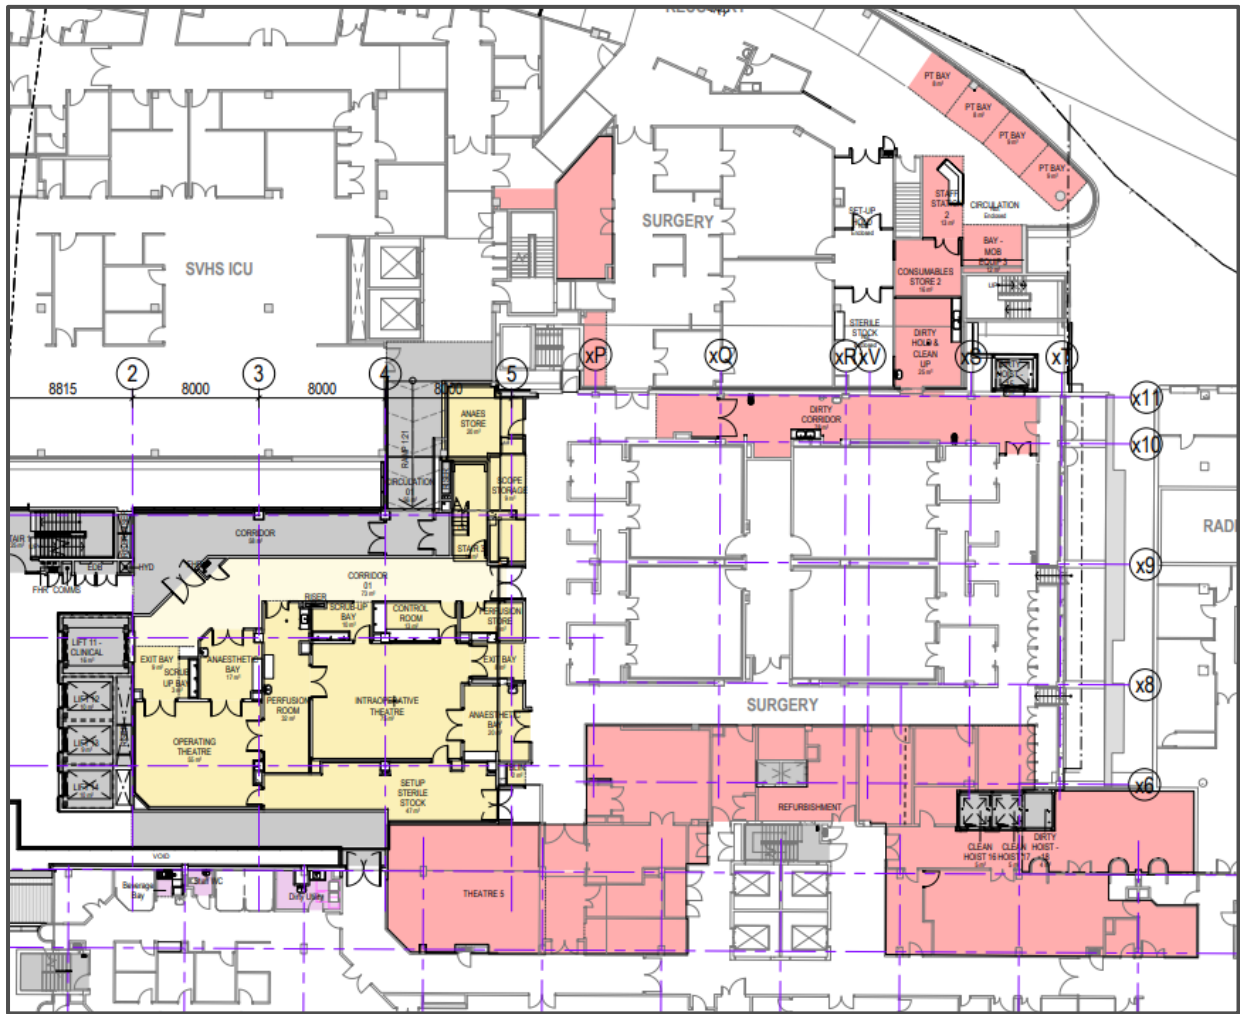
| Proposed GA Plan Level 5 (Source: Modification Report)
